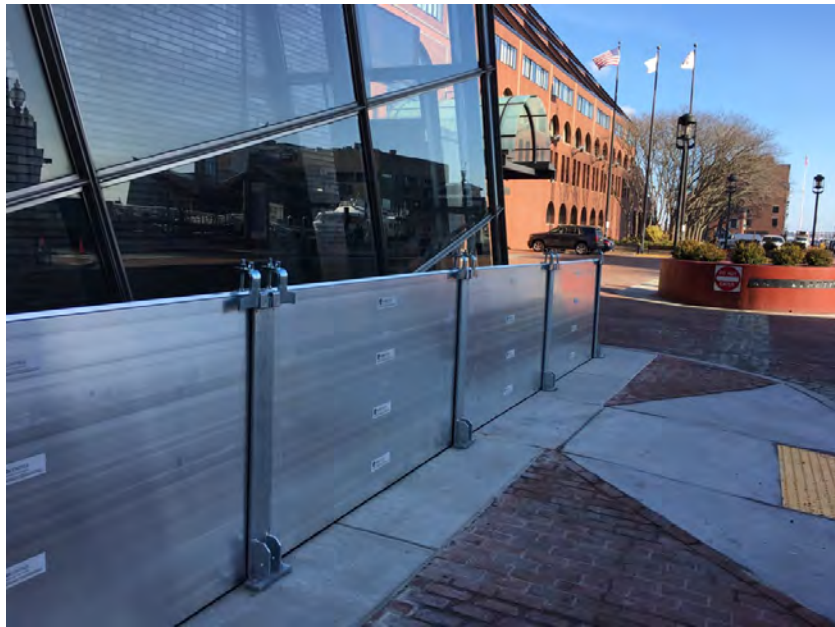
Example of Drop-in Flood Barrier System (Credit: MassDOT)
